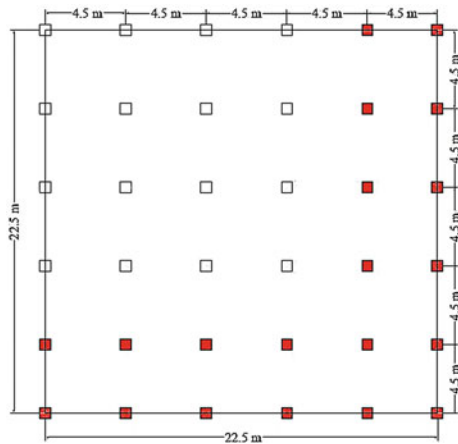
Plan for typical floor of G+3 storey RCC biaxial asymmetric building No. 1 with 4.7% asymmetry in plan in each direction
